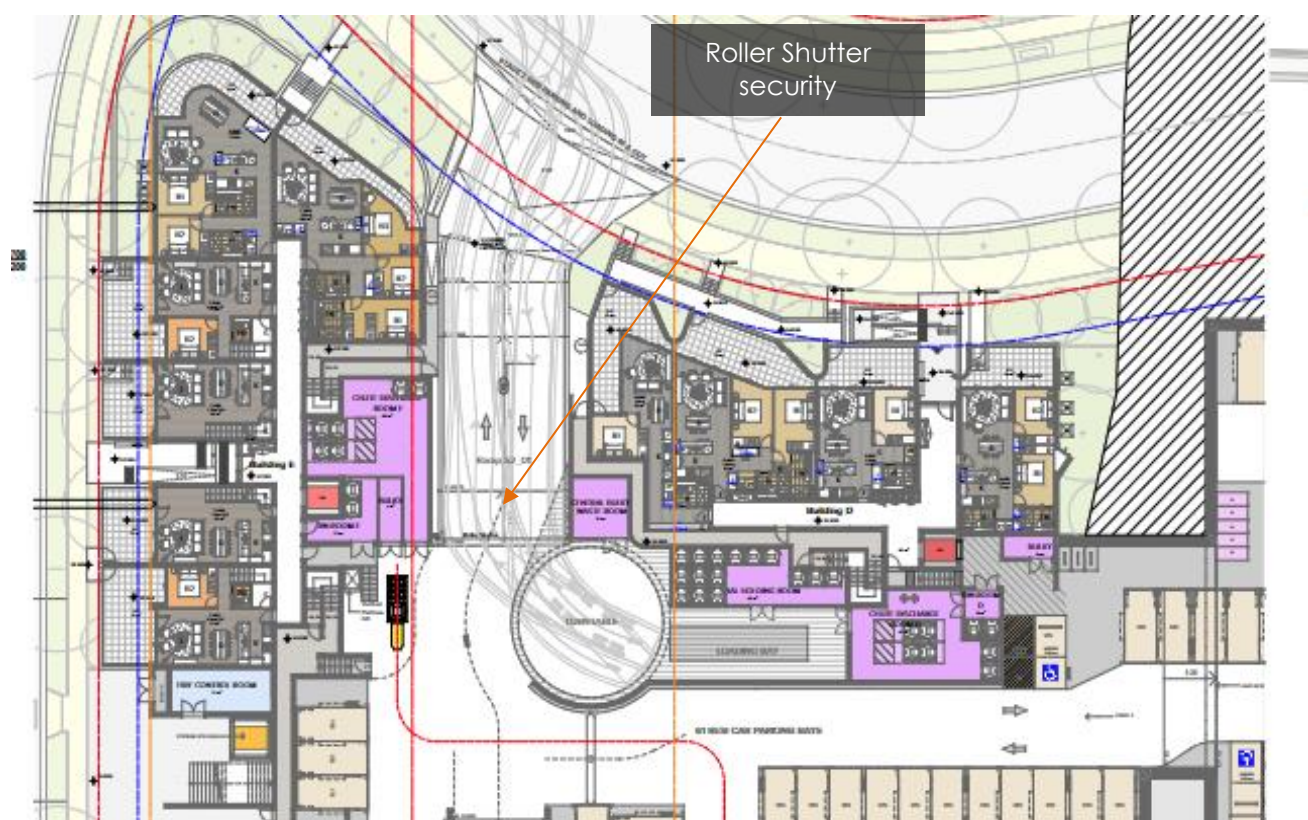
Extract Buildings D, E, F and G Car Parking [RL 52.70] (Source: Turner, 2024)
